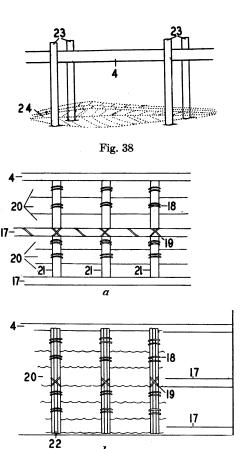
Detail of Wall of Arapesh Ground House, Type E. 4, Wall plate; 23, Uprights of split bamboo arranged alternately inside and outside 4; 24, Palm leaves piled one upon the other.
